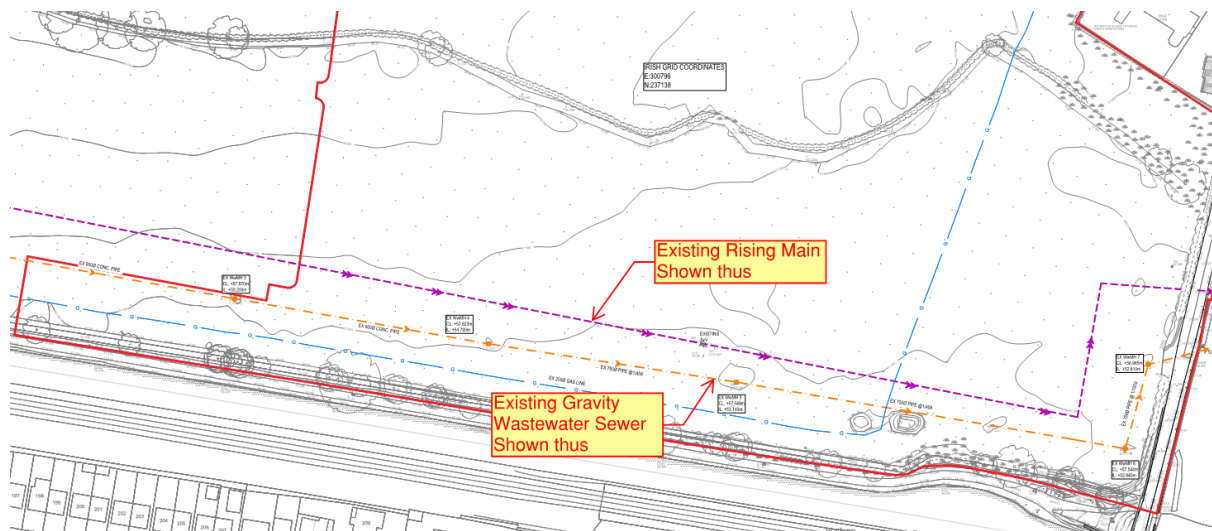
Existing Services illustrating location of existing 750mm dia. concrete wastewater sewer to the south of the subject site in addition to a present existing Rising main running parallel and traversing the subject site.
